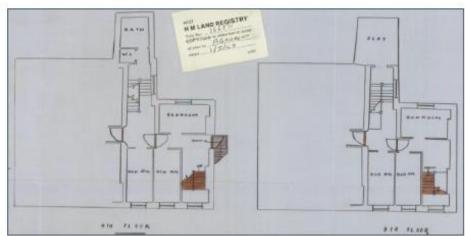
Partial Floor Plans for Fourth and Fifth Floors
